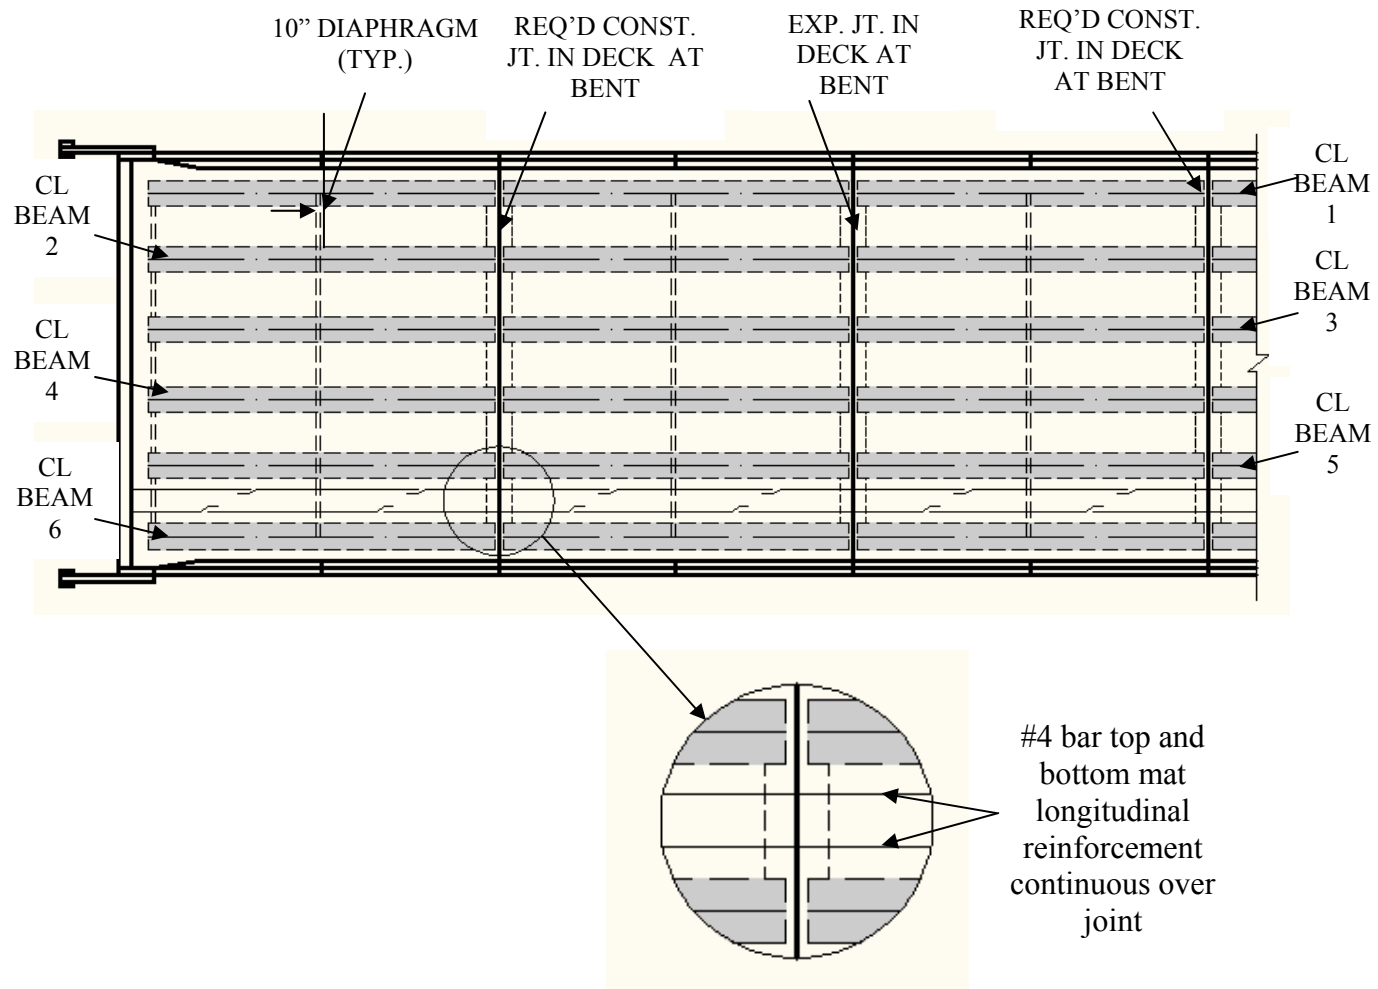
Plan view of recommended continuous deck detail with #4 bar longitudinal reinforcement continuous over joint (modified from GDOT SR 46 Over Oconee R. plan)
